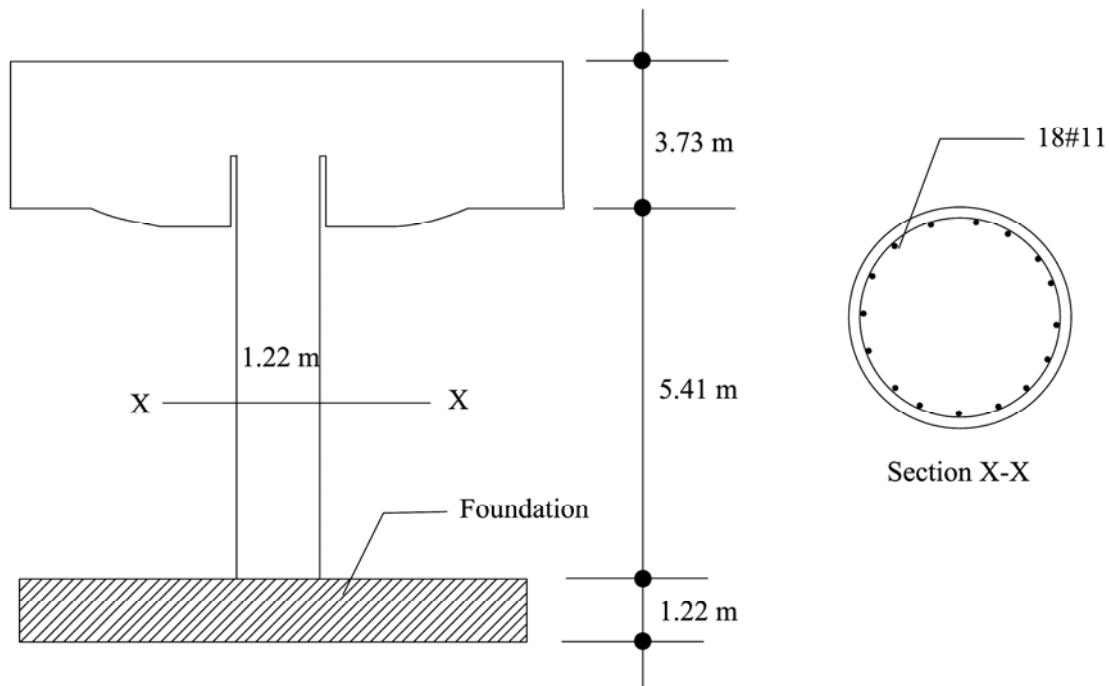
Pier cross section and bridge pier specimen configuration
